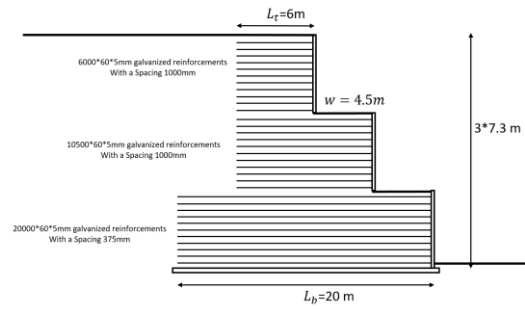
The constructed multi-tiered MSE wall details next to the WTC tower in Tabriz (Iran) against the optimized wall section
